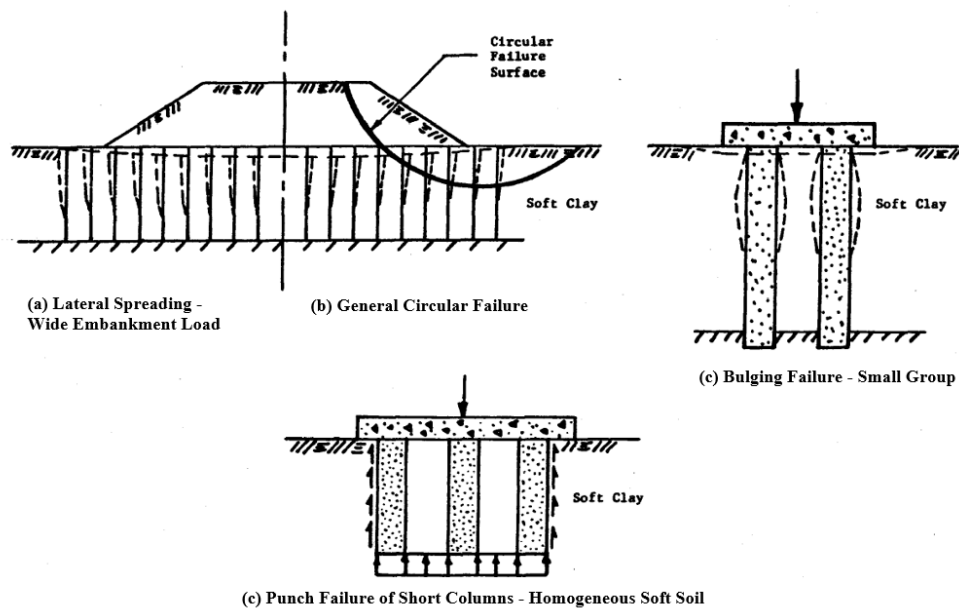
Stone column group failure mechanism (a) Lateral Spreading, (b) General Circular Failure, (c) Bulging Failure, (d) Punching Failure (Source: Barksdale & Bachus, 1983)
